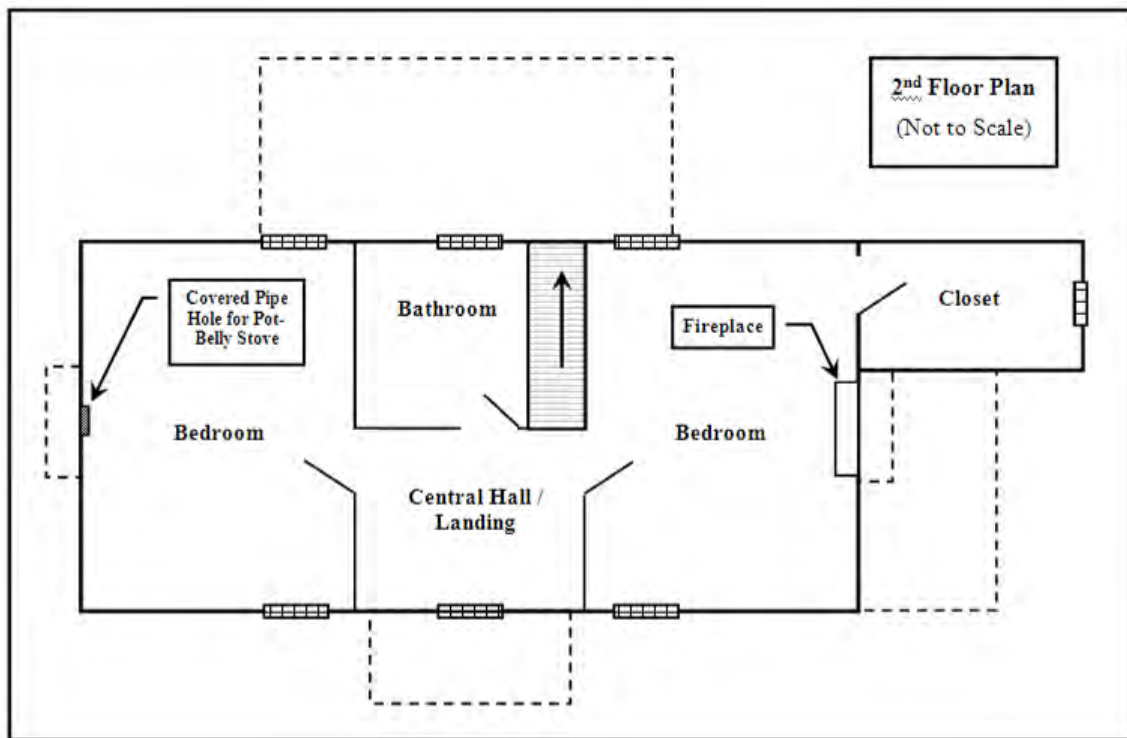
Top Floor Interior Plan of Cedar Knoll Main House.
